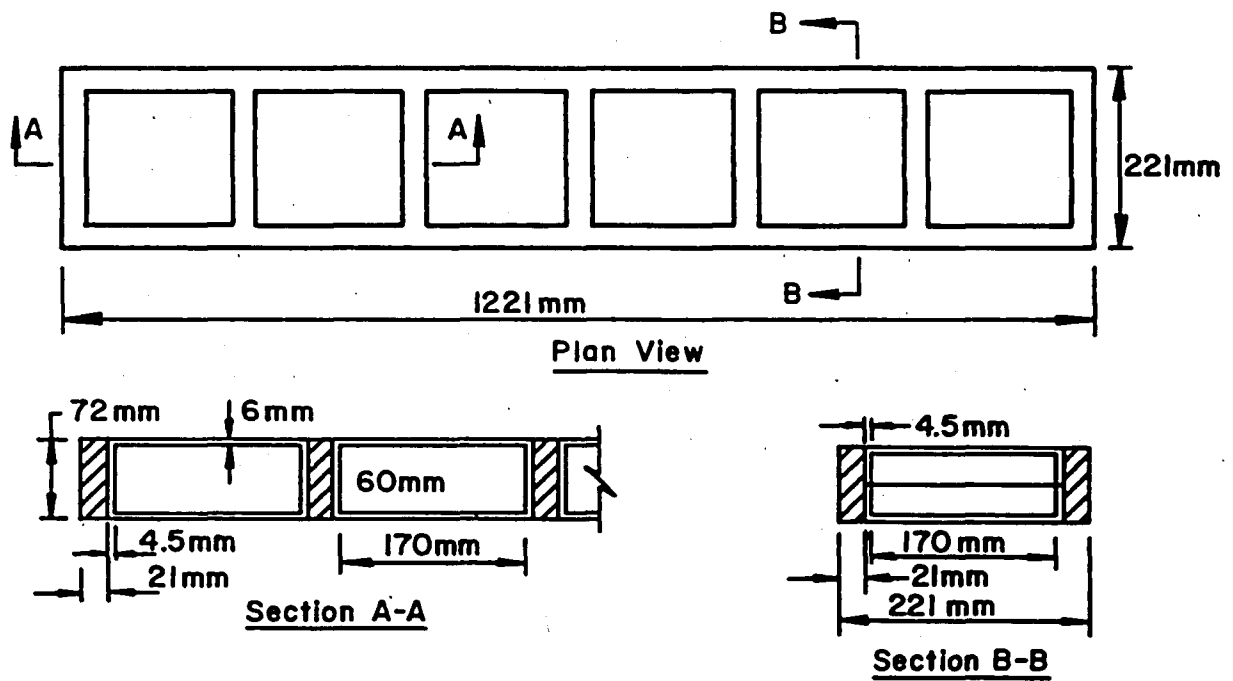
Dimension And Cross-Sectional Detail Of The Strip Specimen
